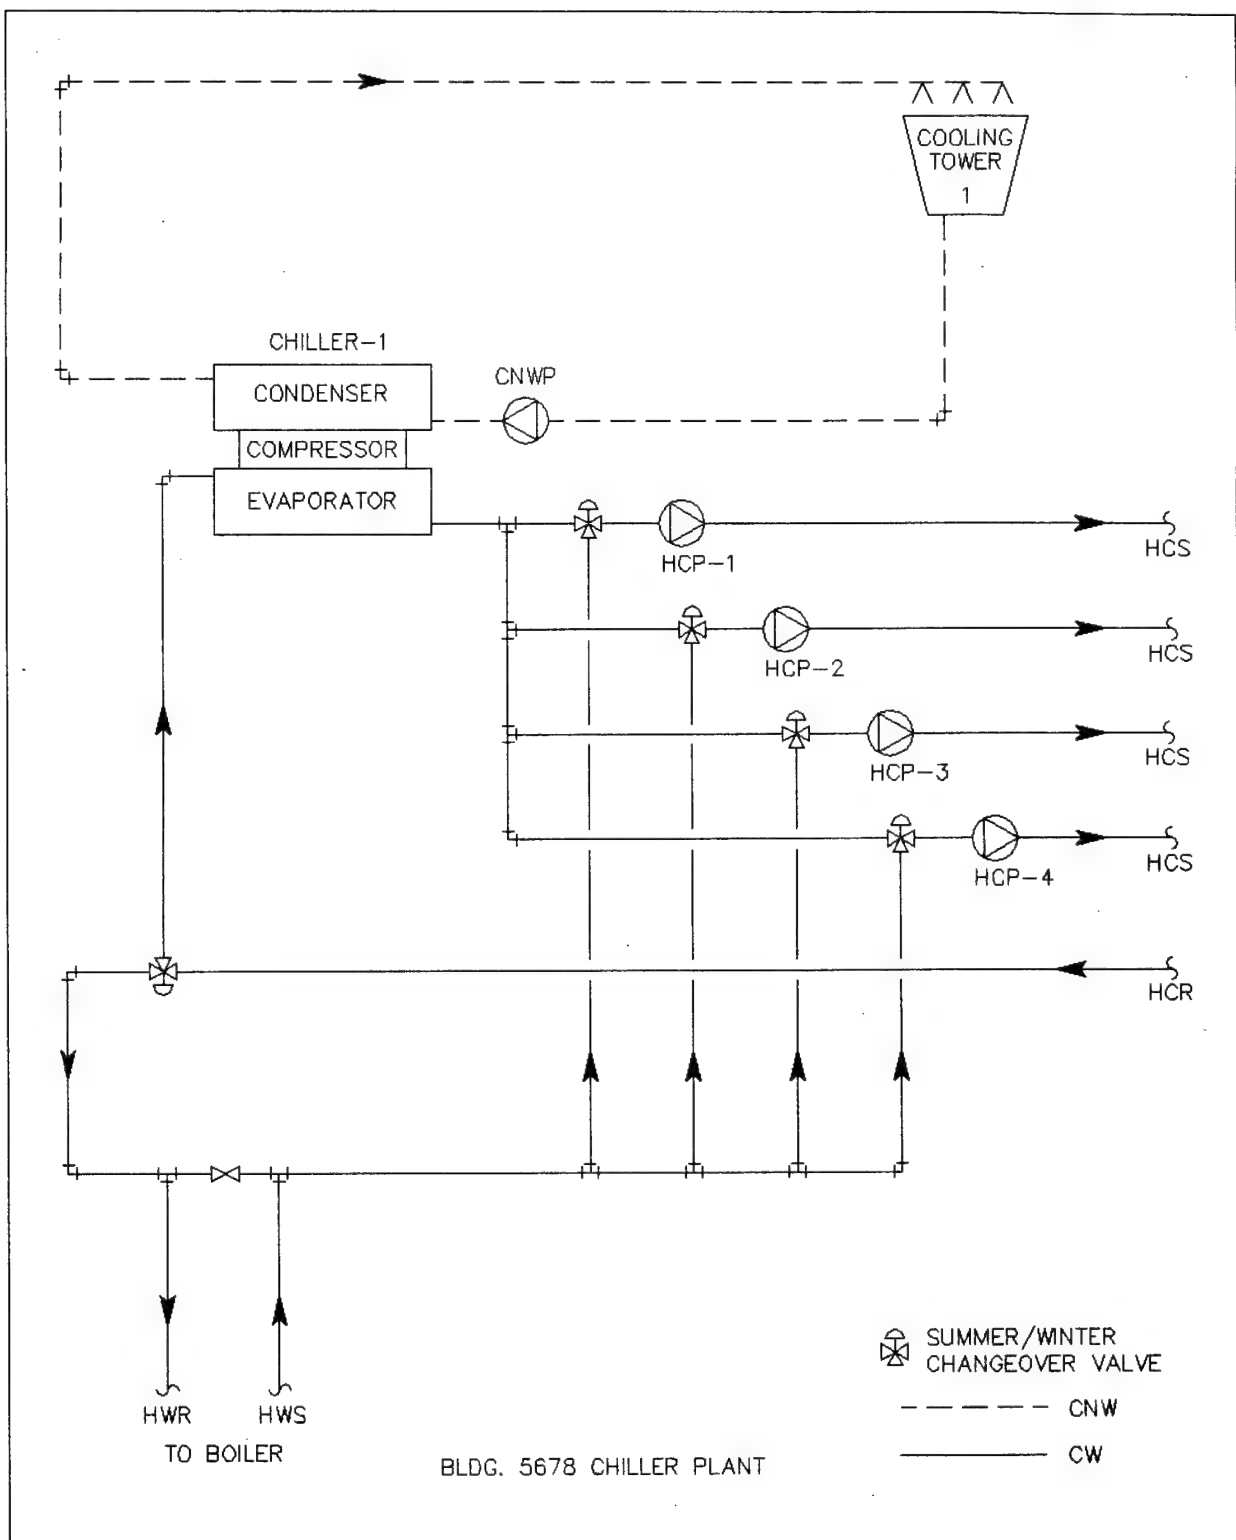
SCHEMATIC OF CHILLERS, CENTRAL PLANT 5678
